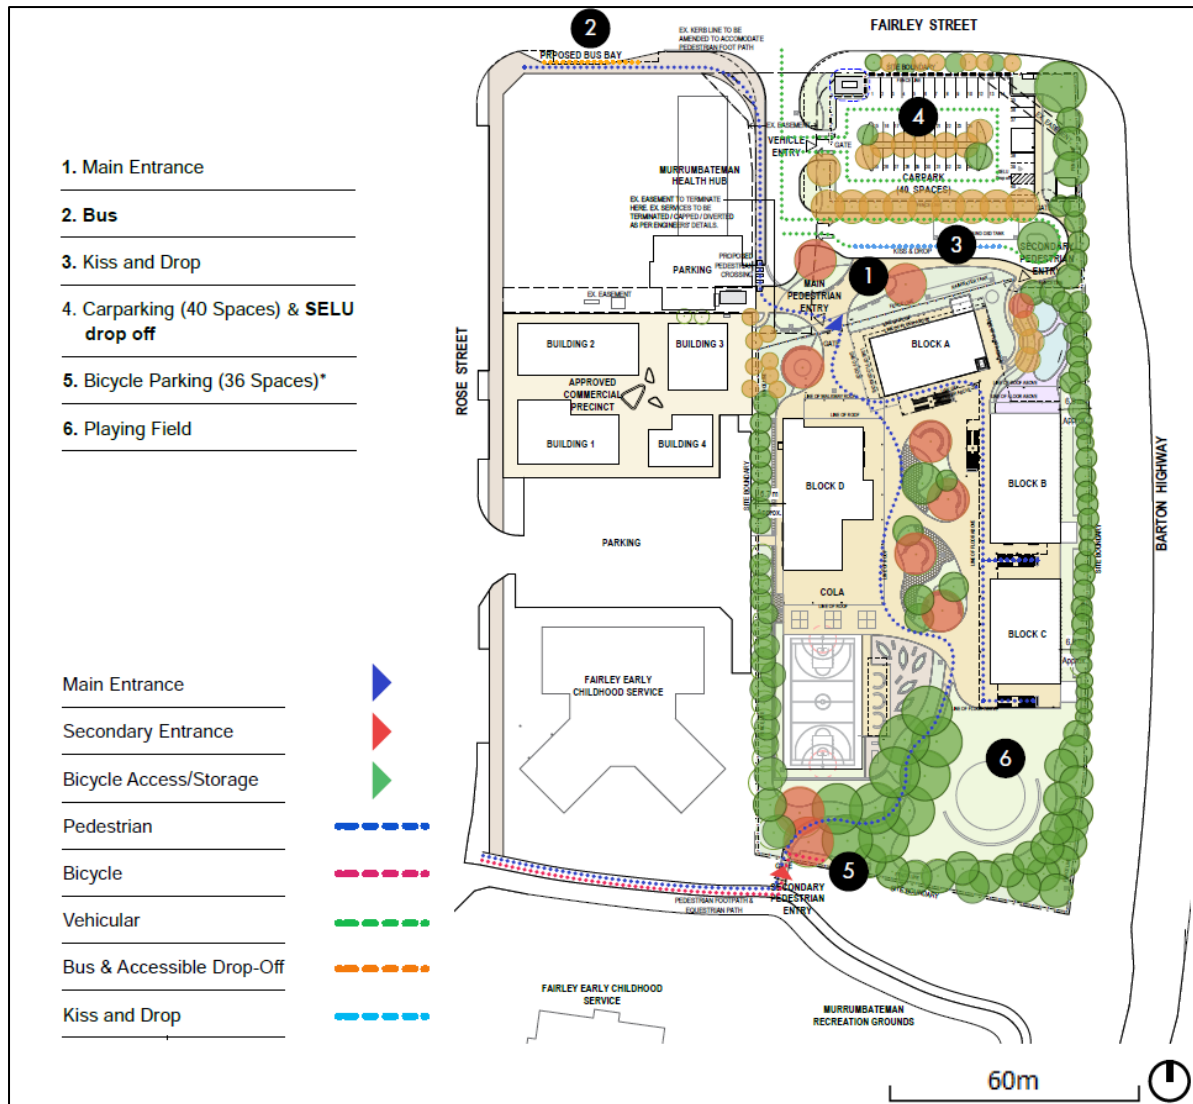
| Site Layout (Source: Applicant's RtS 2021)
